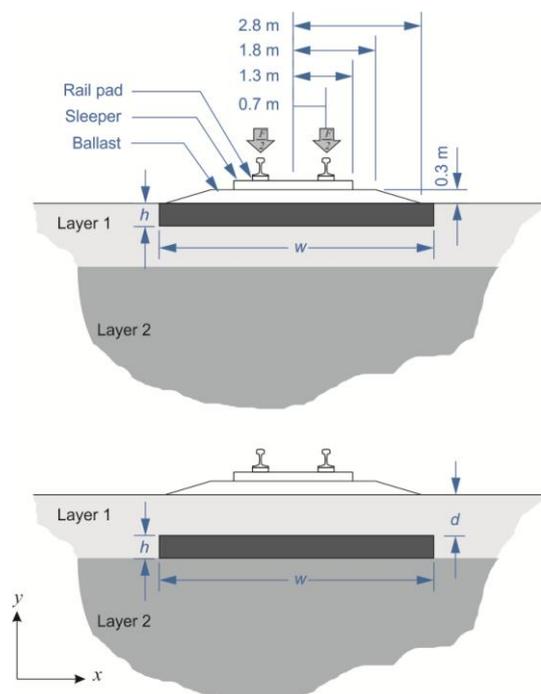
Example sketch of track section at layered soil site of Lincent with soil stiffening (top) and wave impeding block (bottom)
